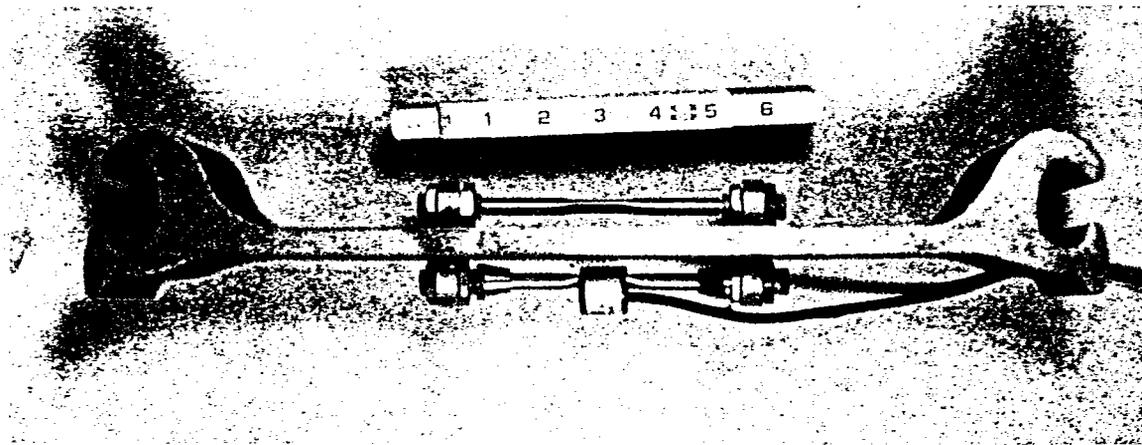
Vibrating wire strain gages applied to PSX32 sheet pile section; used to monitor deformation of the sheet piles during changes in hydrostatic pressure on one side of a drydock wall. A bending moment diagram can be accurately constructed from data collected from sets of dual-position strain gages placed at varying elevations along the piles, before driving (Photograph by M. X. Haley).
